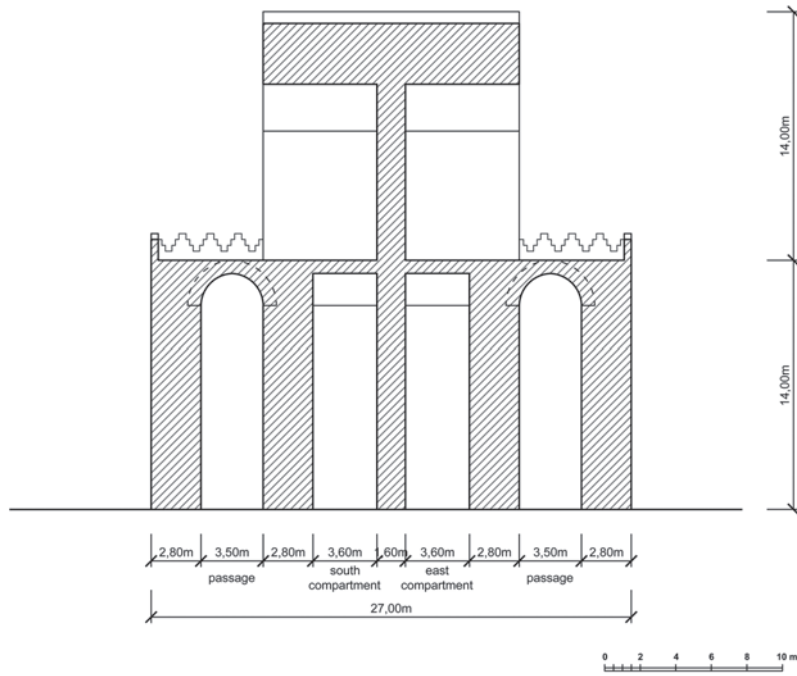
Reconstructed architectural section CC by Ahmet Çinici at a scale of 1:250.
